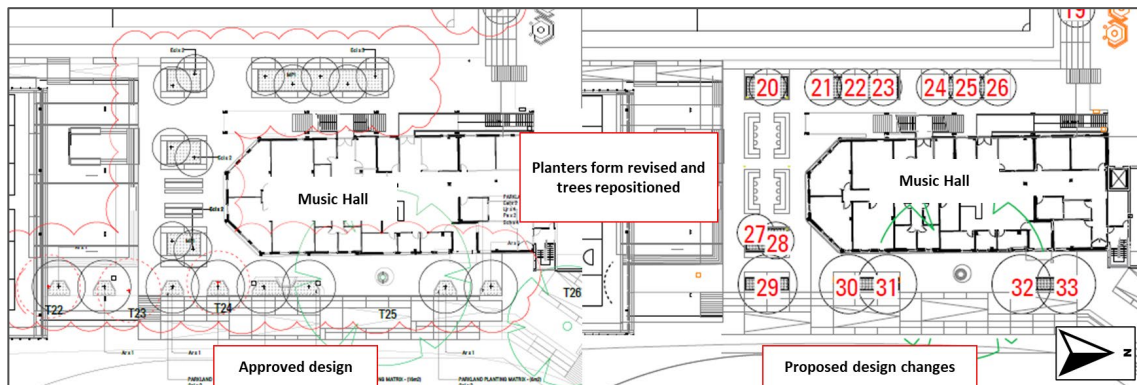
| Proposed amendments to the landscape design - Chapel Drive (Source: SSD-10371 (left) and Applicant's Modification Report 2022 (right))
